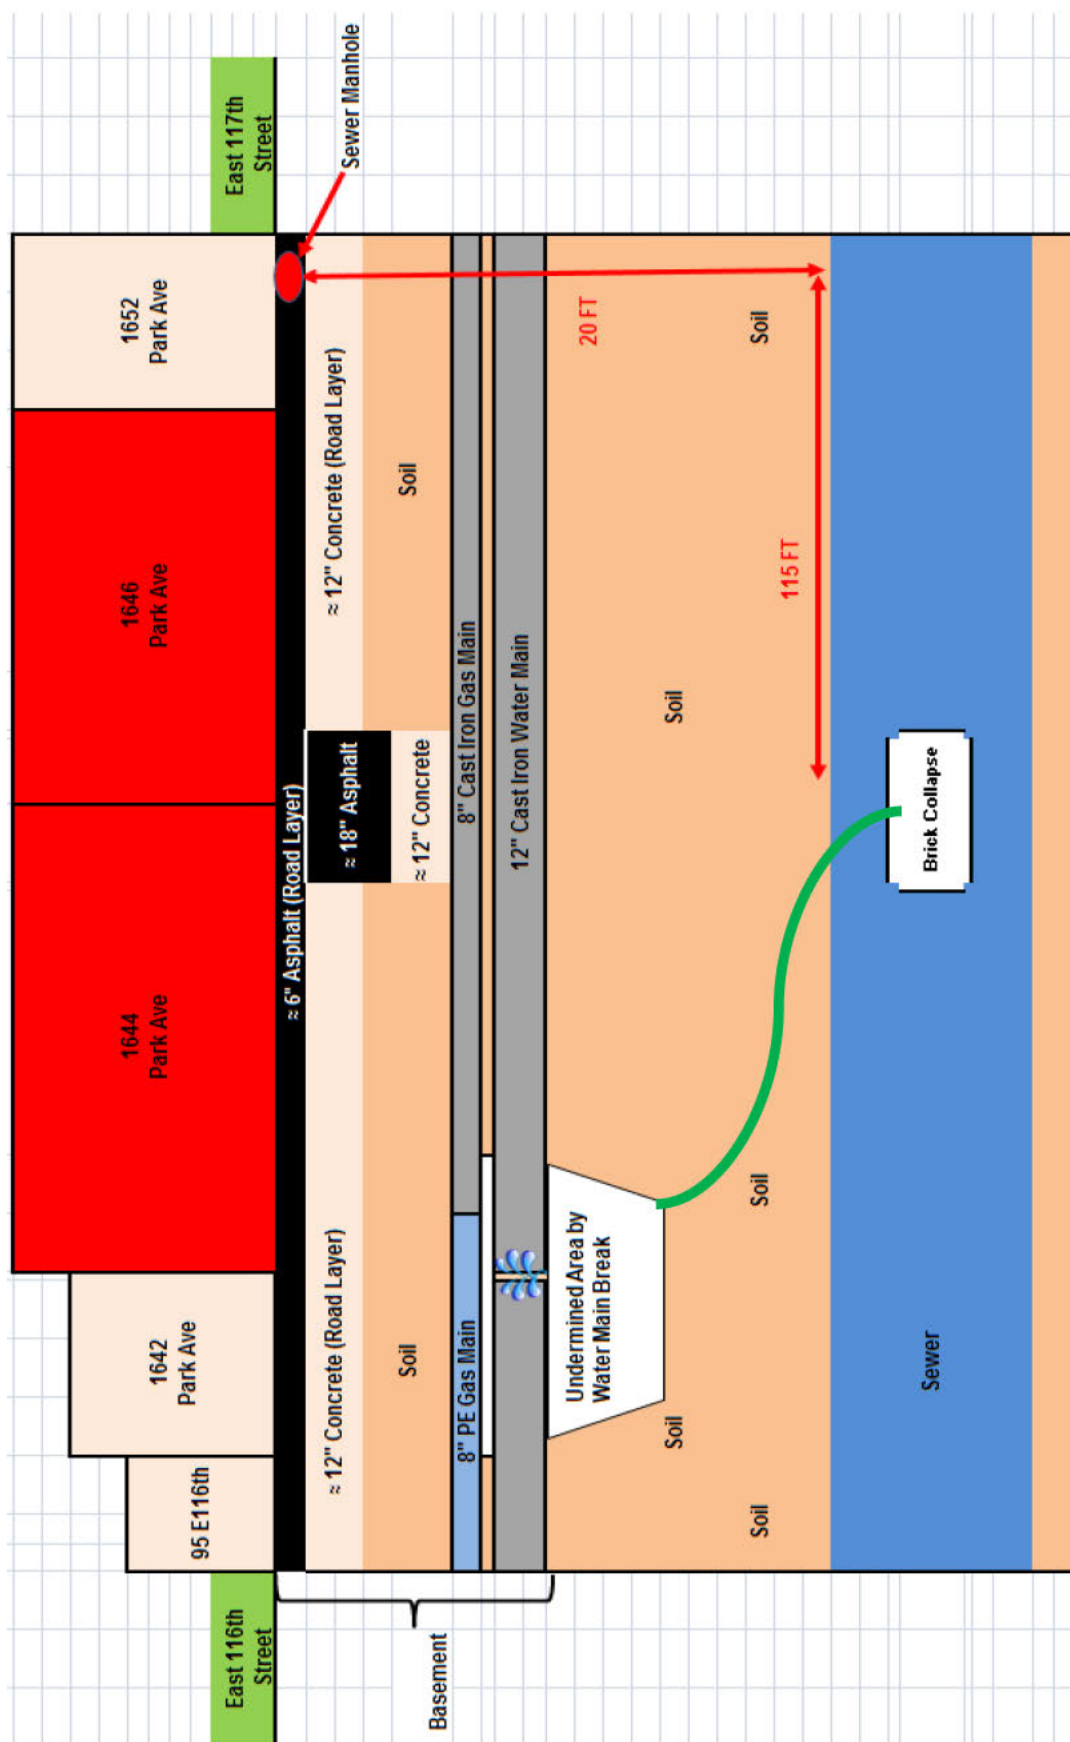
Elevation view of the road layers and utilities along Park Avenue between E 116th & E 117th Streets (not to scale).
